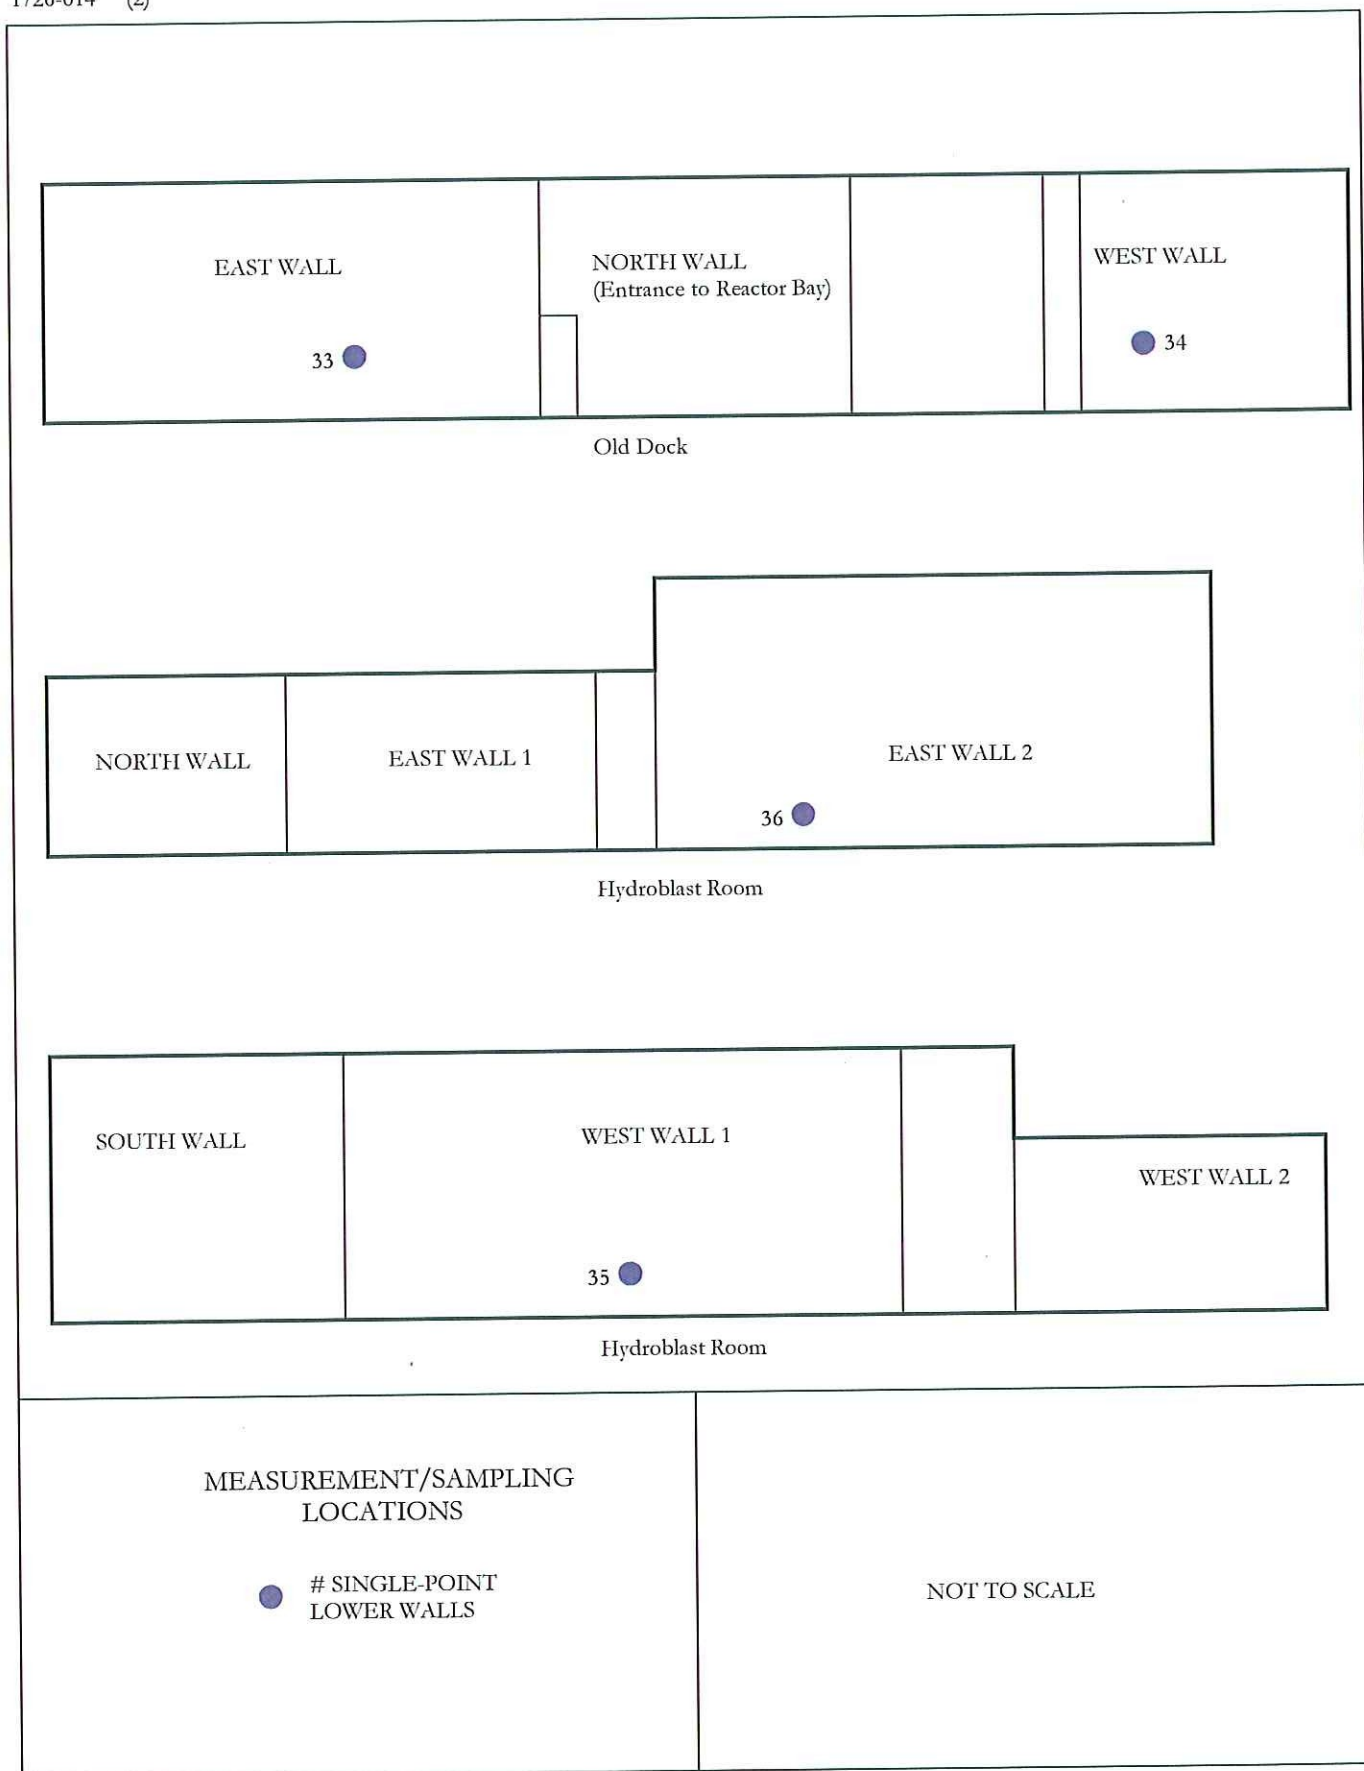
Old Dock and Hydroblast Room - Measurement and Sampling Locations
